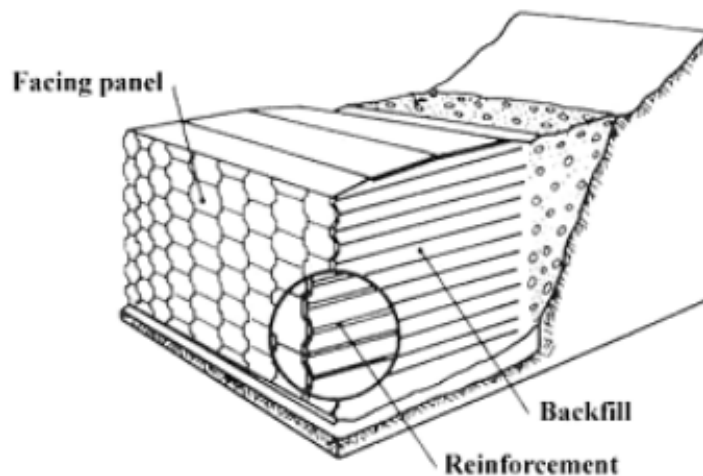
Schematic view of a MSE wall cross-section (FHWA 2009).
